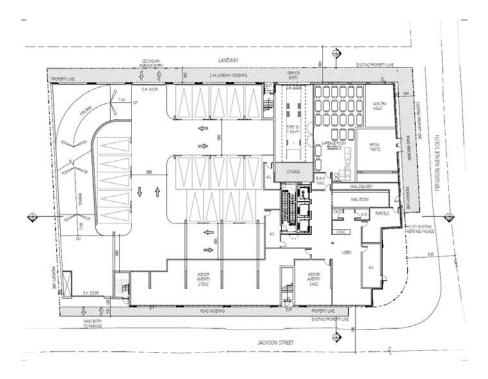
Conceptual Ground Floor Plan by G+C Architects indicating the heritage portion of the original building to be reconstructed.
